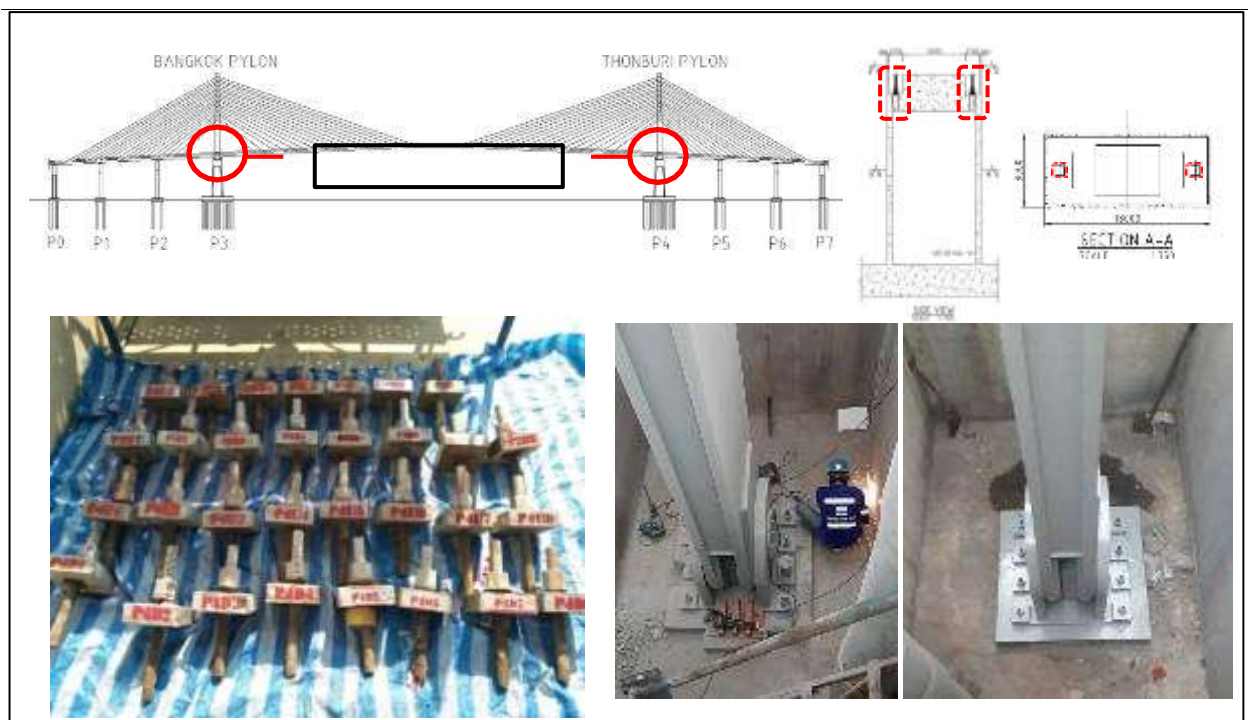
Replacing the Anchor Bolts that Secure the Base of a Steel Support Column
